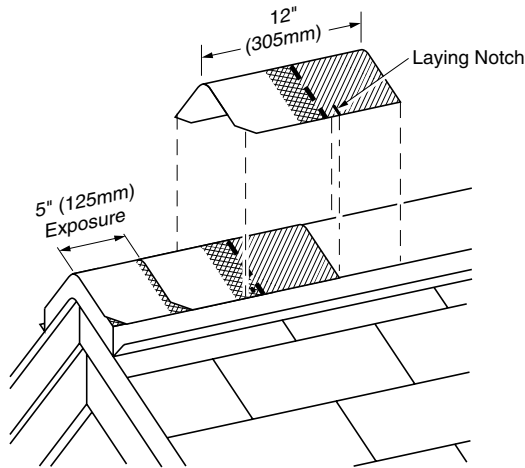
Use laying notches to center shingles on hips and ridges, and to locate the 5" exposure.
